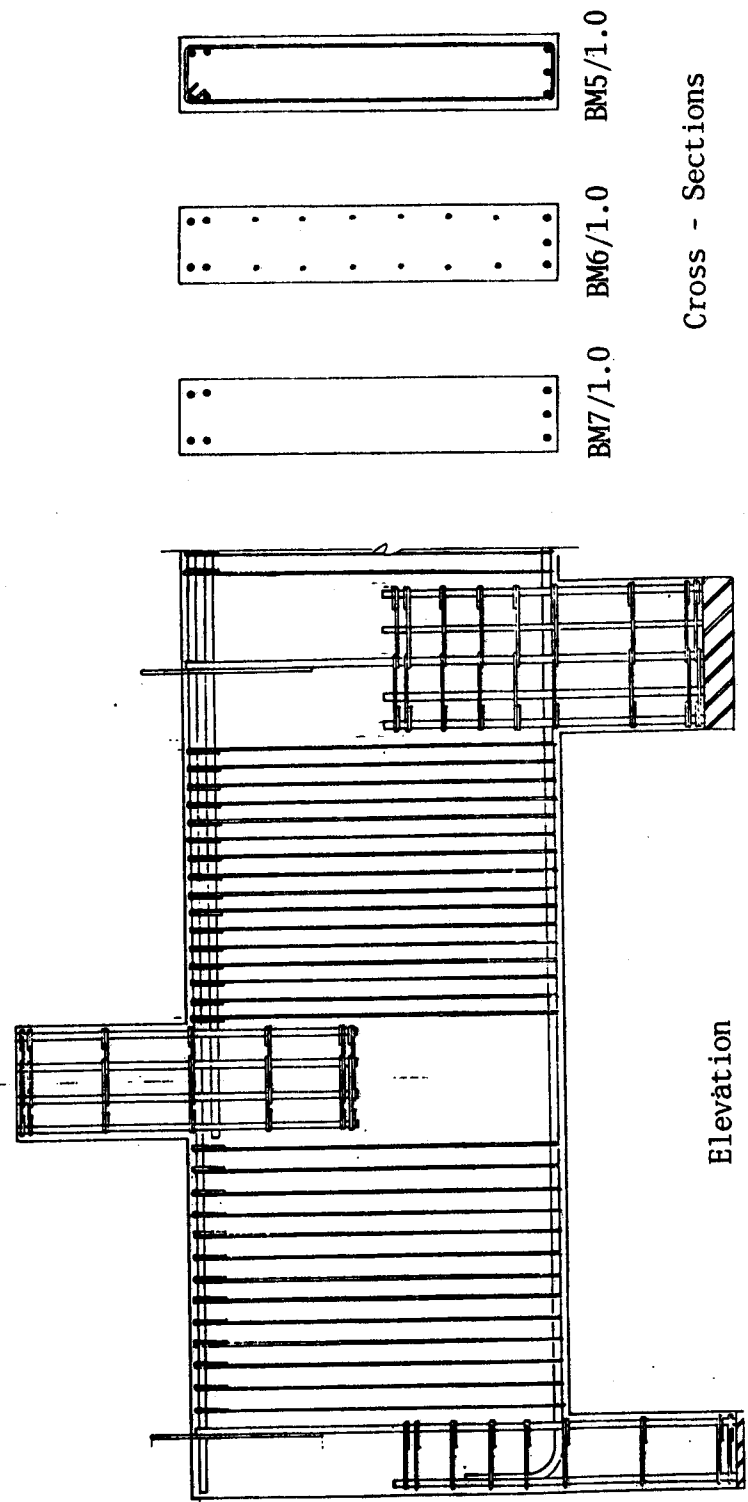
Beam 5/1.0, 6/1.0, and 7/1.0 Reinforcement Details
